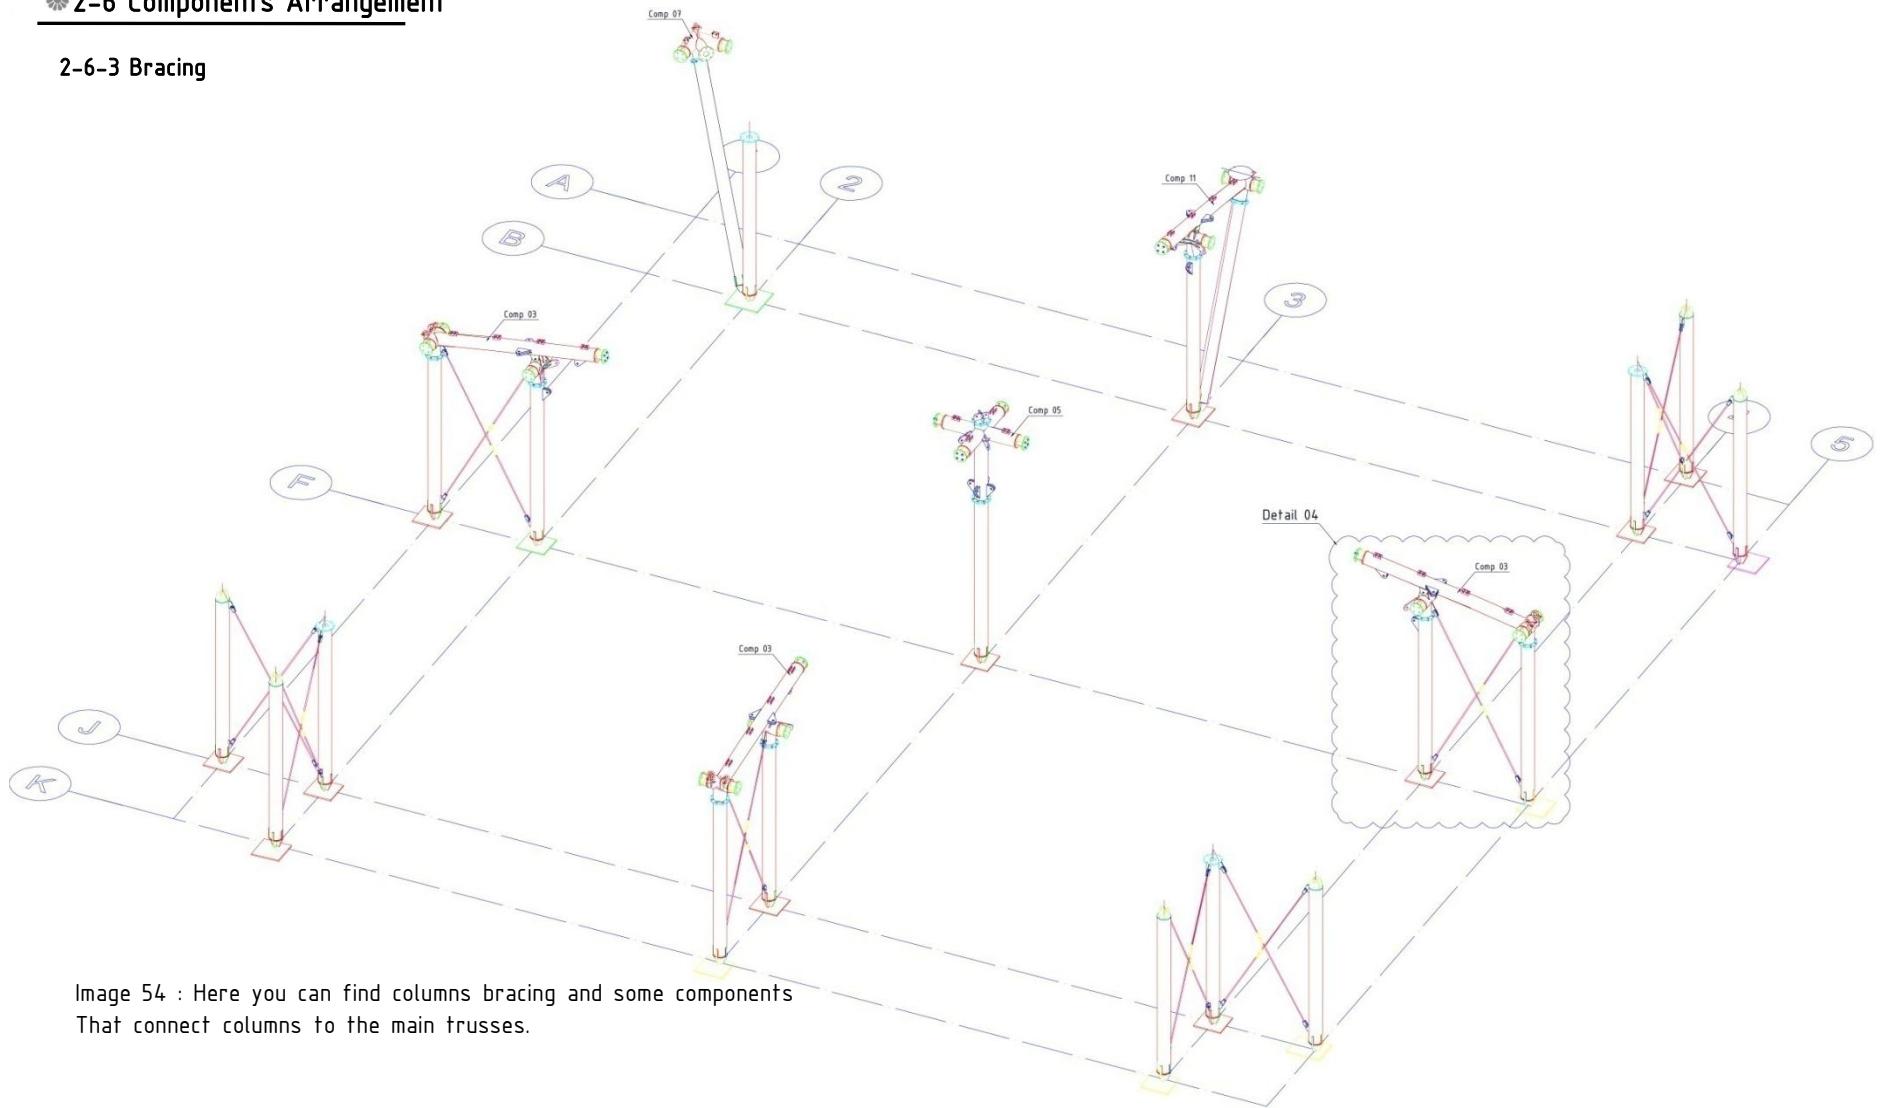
Here you can find columns bracing and some components That connect columns to the main trusses.
